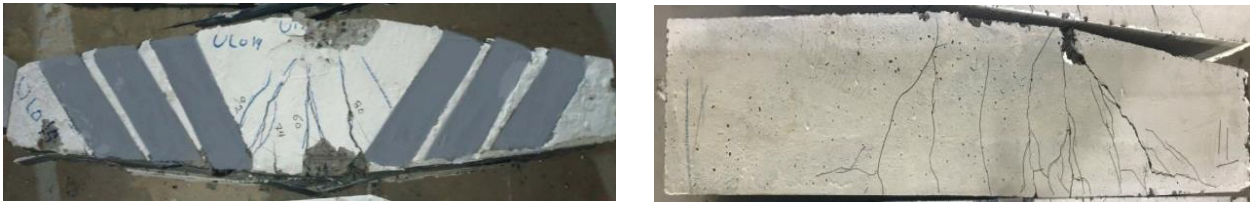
Flexural failure and shear failure of reinforced concrete gable beams.
